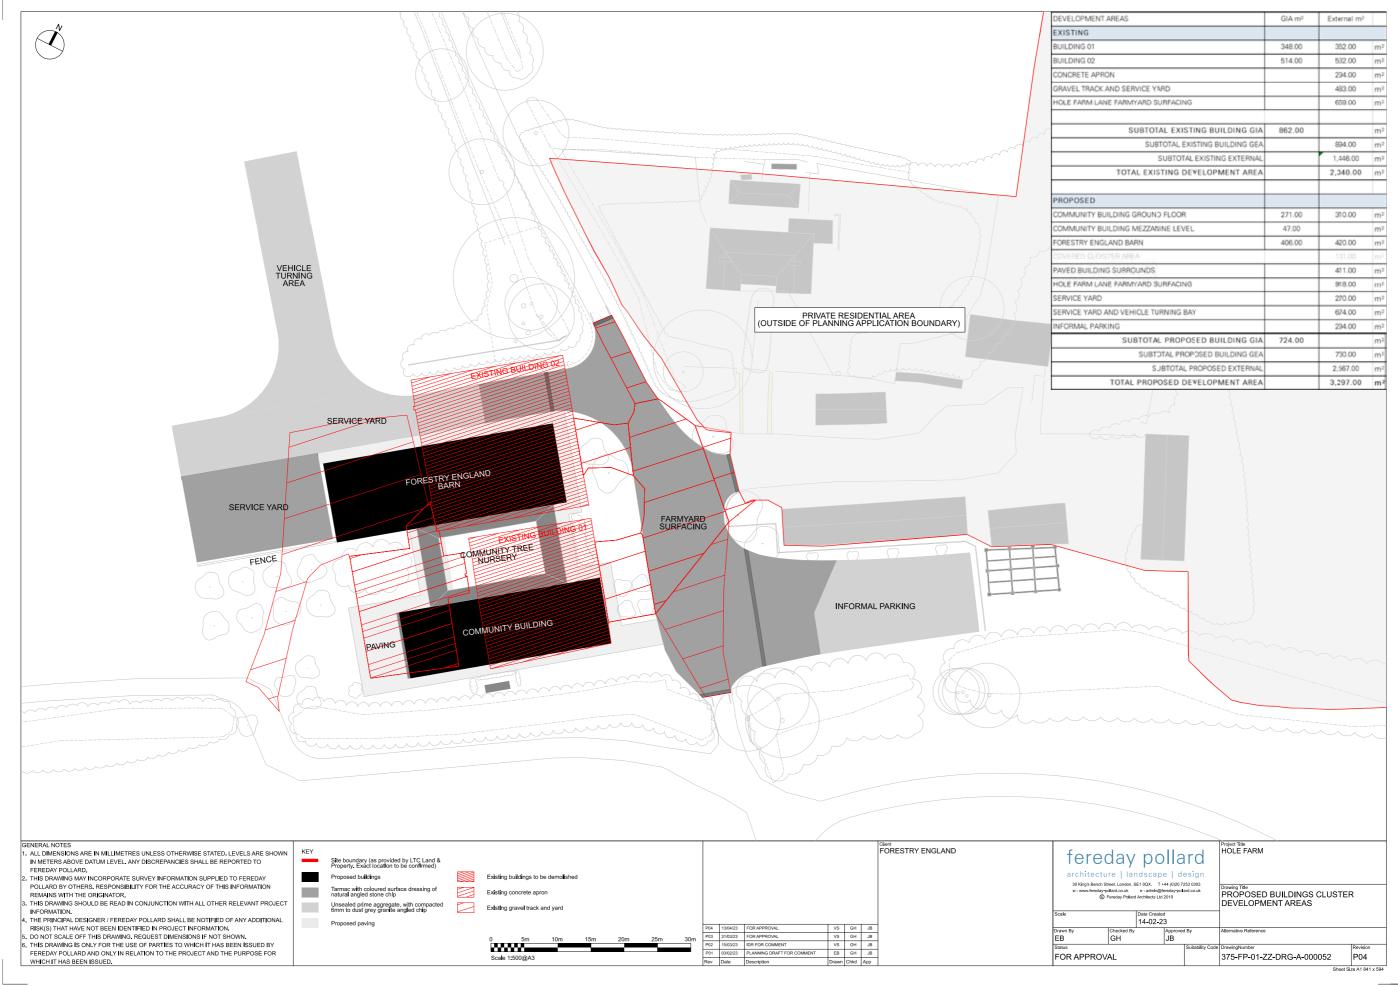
Plan of site showing footprints of proposed new buildings in black and footprints of buildings to be demolished in red
